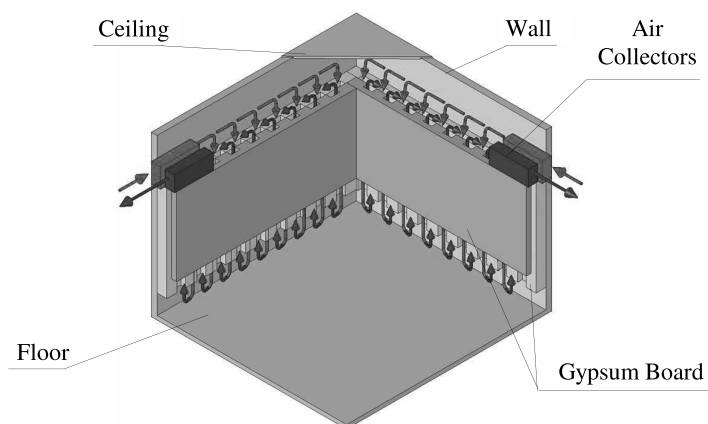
An example of a drywall thermal energy storage system installed in a dwelling
